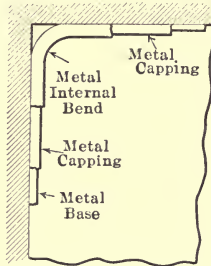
ELBOW FORMED WITH FITTINGS.
